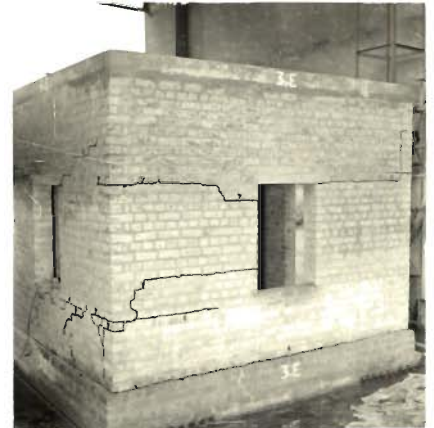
\_ CRACKS IN SOUTH AND EAST WALLS ( MODEL 3 )
